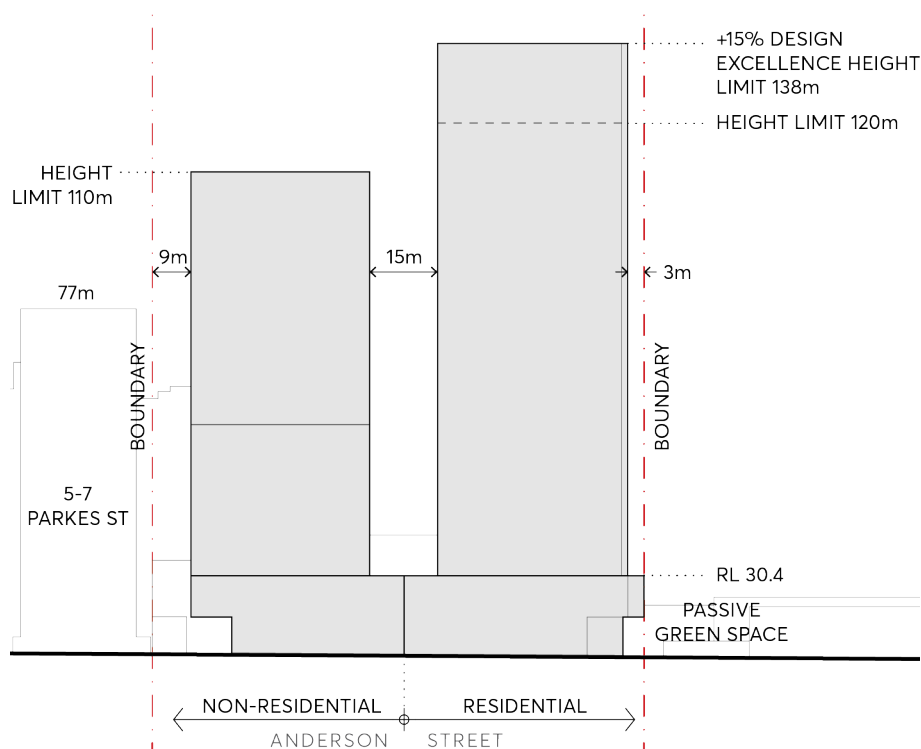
Building envelope Anderson Street elevation
